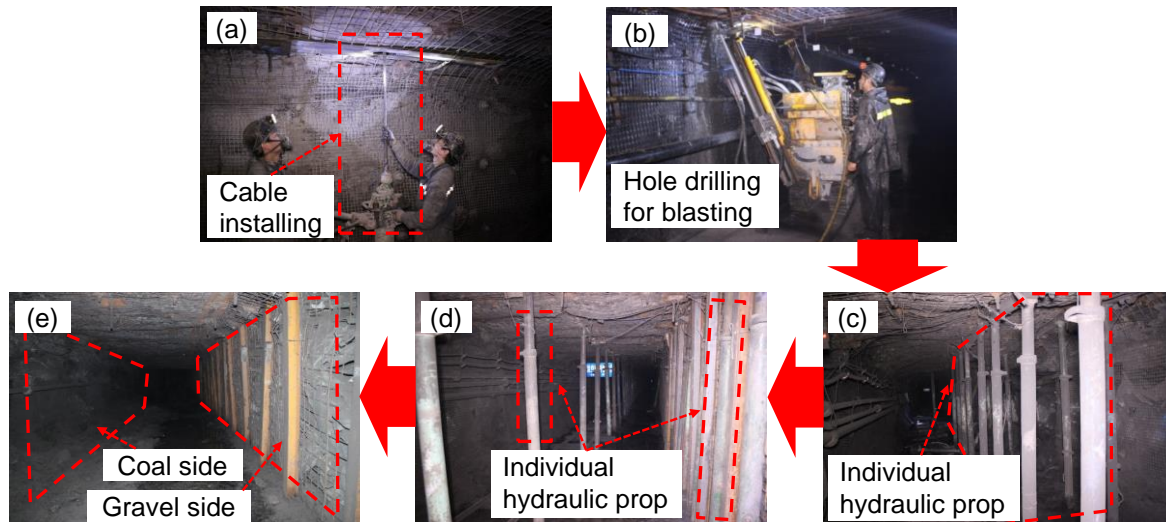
Technological process of gob-side entry formed by roof cut: (a) Installing the constant resistance and large deformation cables before roof pre-fracturing; (b) The hole drilling used to pre-fracture the gate roof before mining; (c) The advancing support for the working face mining; (d) The temporary supporting for advancing mining during the gob-side entry retaining; (e) The gob-side entry after removing the temporary supporting when the gob-side entry was stabilized.
